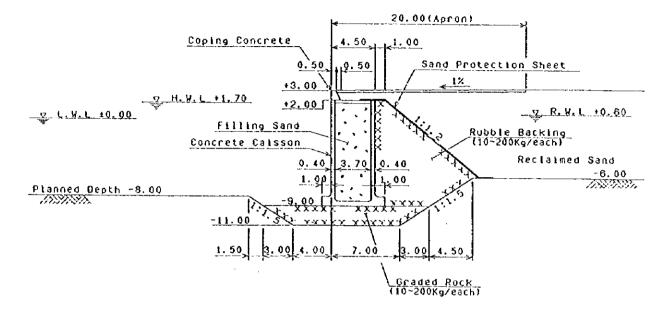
(2) Typical Cross Section of Quaywall E1,E2 (RC Caisson)
